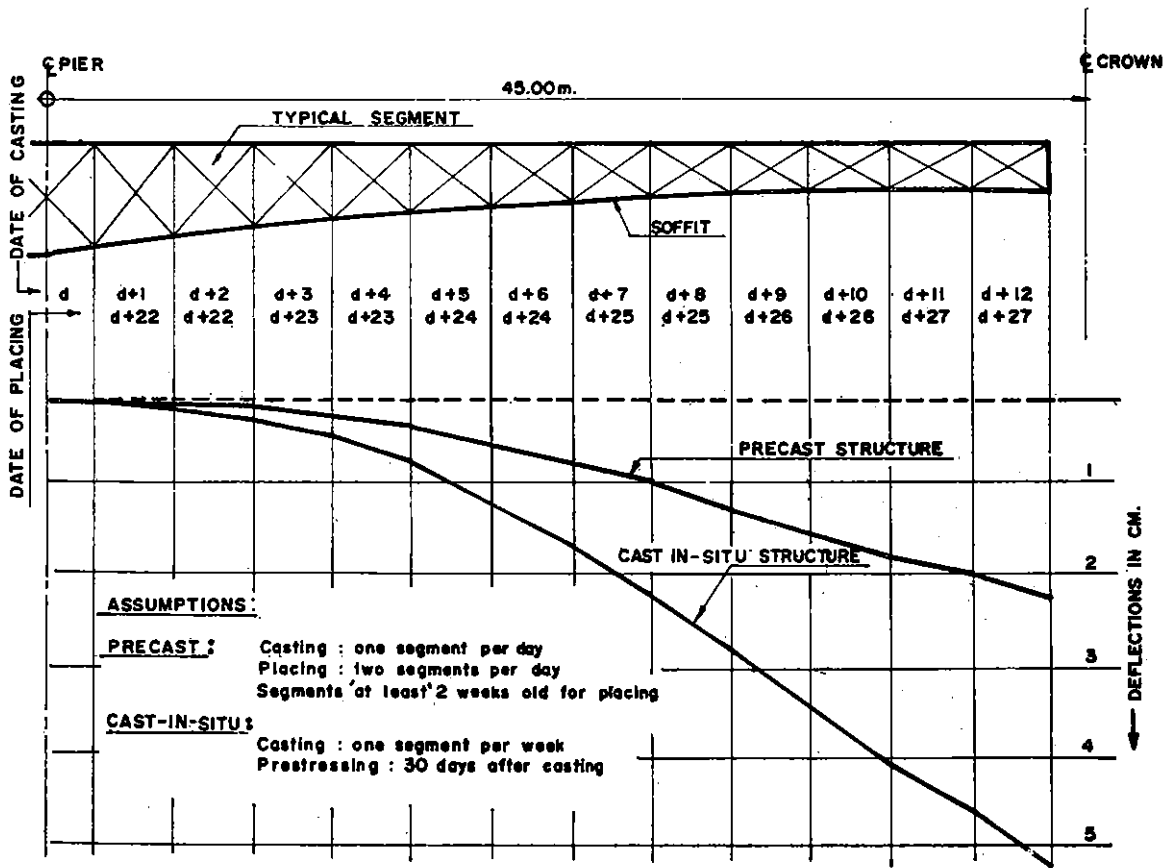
Comparison of soffit deflections between precast and cast-in-situ structures.
